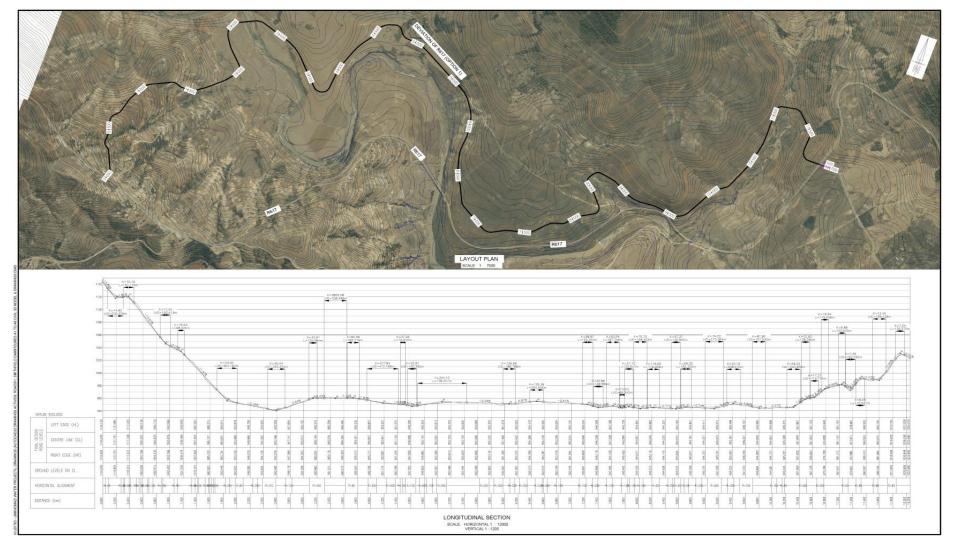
Smithfield Dam – Layout plan and longitudinal section of the deviation of road R617
